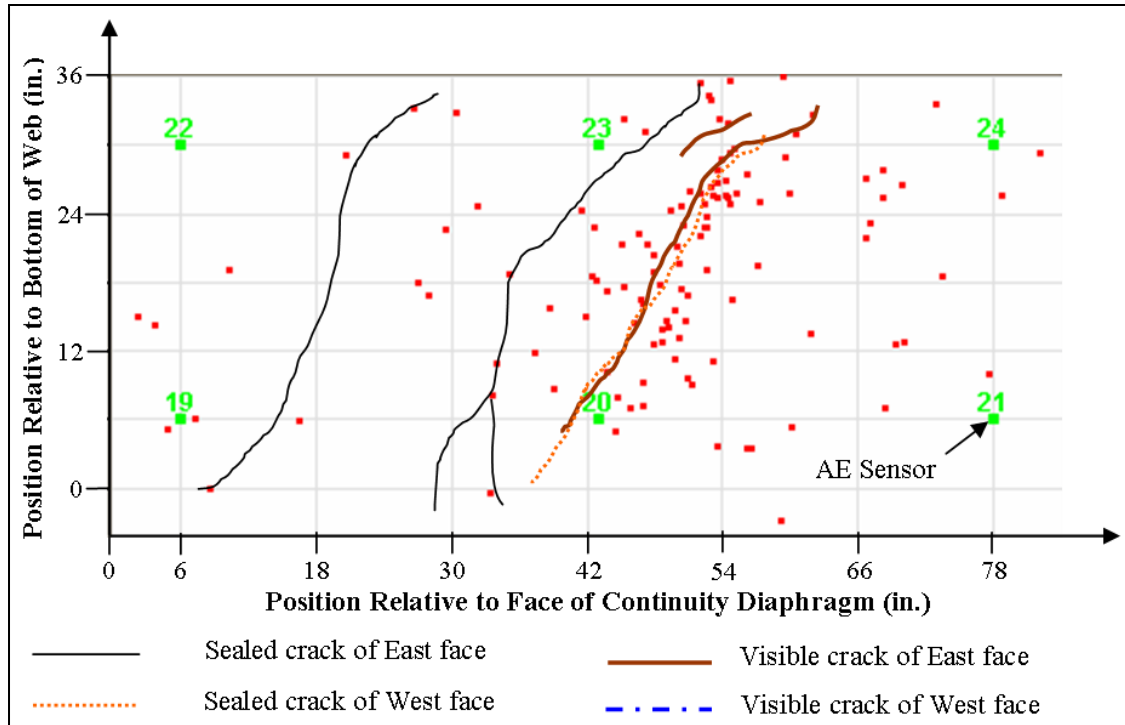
AE event location and crack pattern of Span 11 Girder 7 (Xu 2008)
